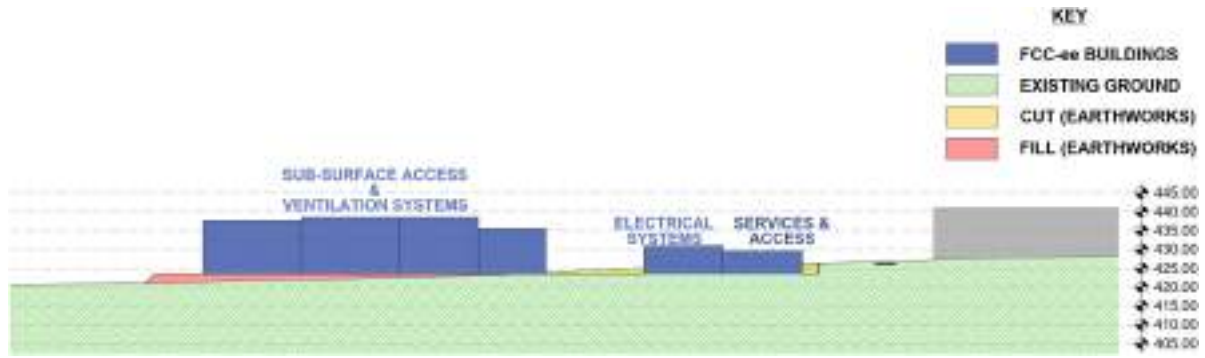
Preliminary cross-sectional diagram of PA site
